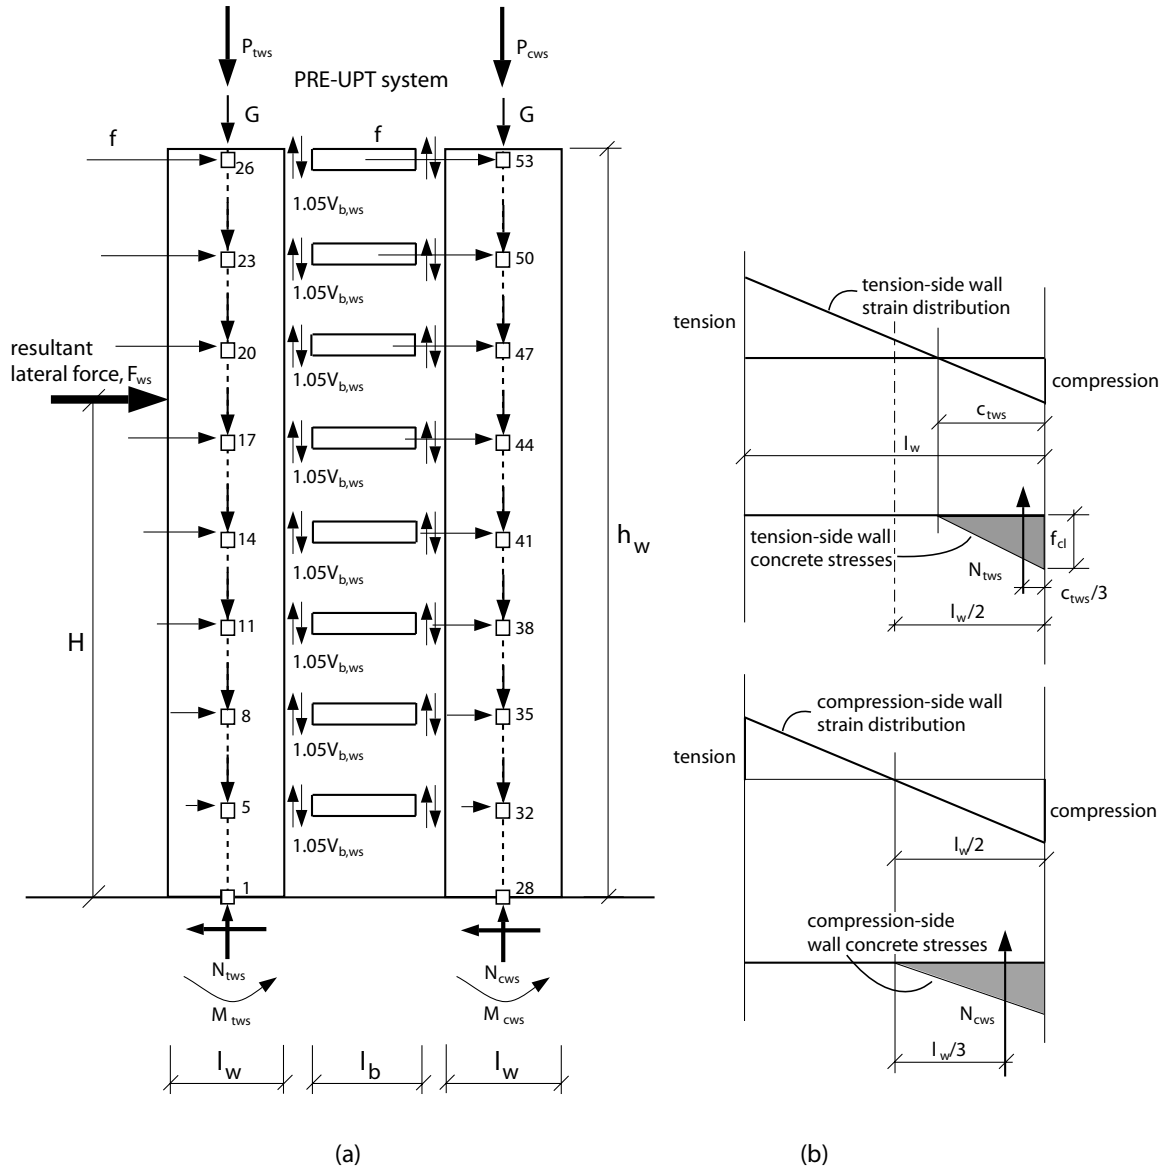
Coupled wall softening state for systems with precast concrete walls:
